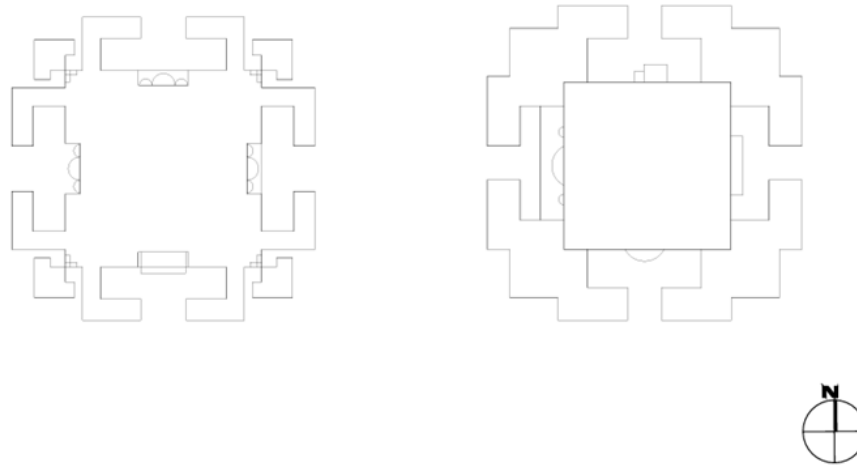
Floor plan of Tashigomang's second (left) and first (right) levels, redrawn by Authors (Su 1996).
